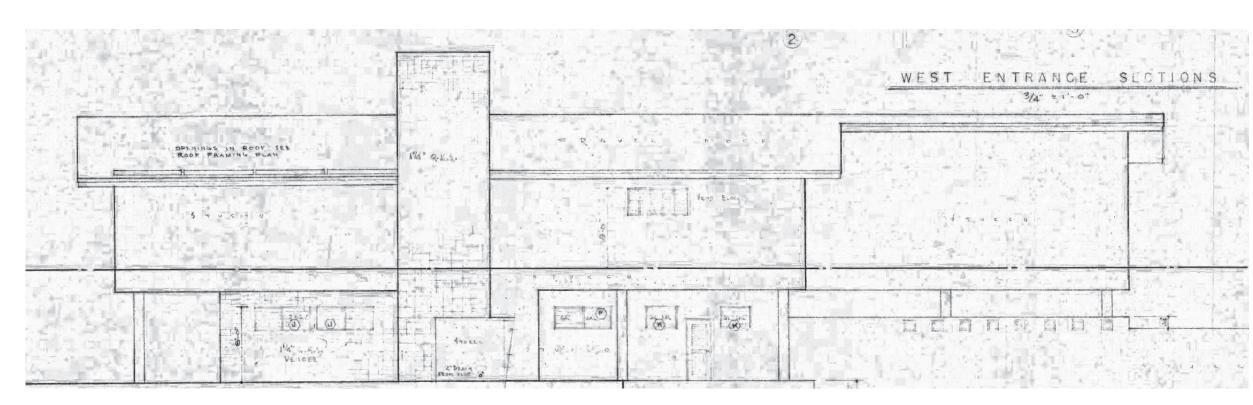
IMAGE W: ORIGINAL BLUEPRINT WEST ELEVATION (KECK. JR. ARCHITECT1956)
